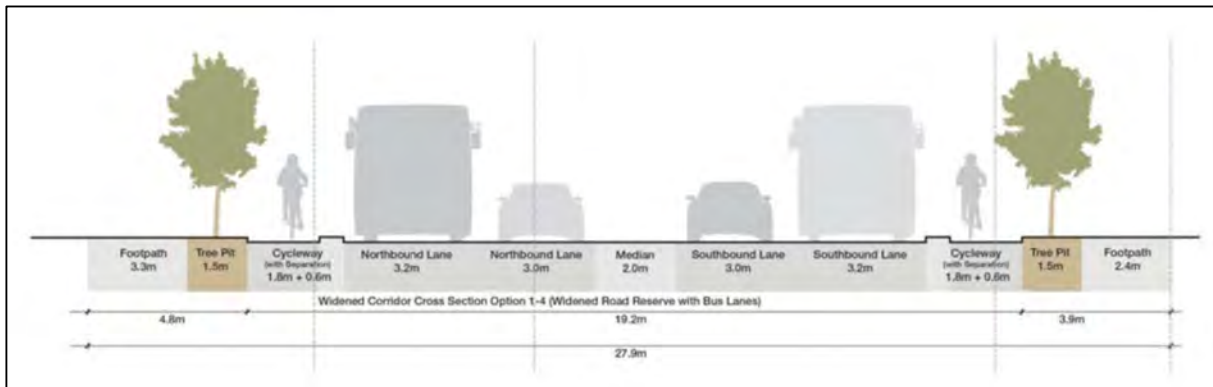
Carrington Road Upgrade mid-block cross-section
